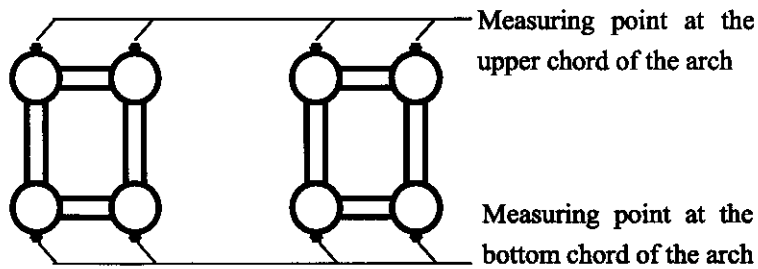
Layout of the strain gauges on the steel tubes at each cross-section
